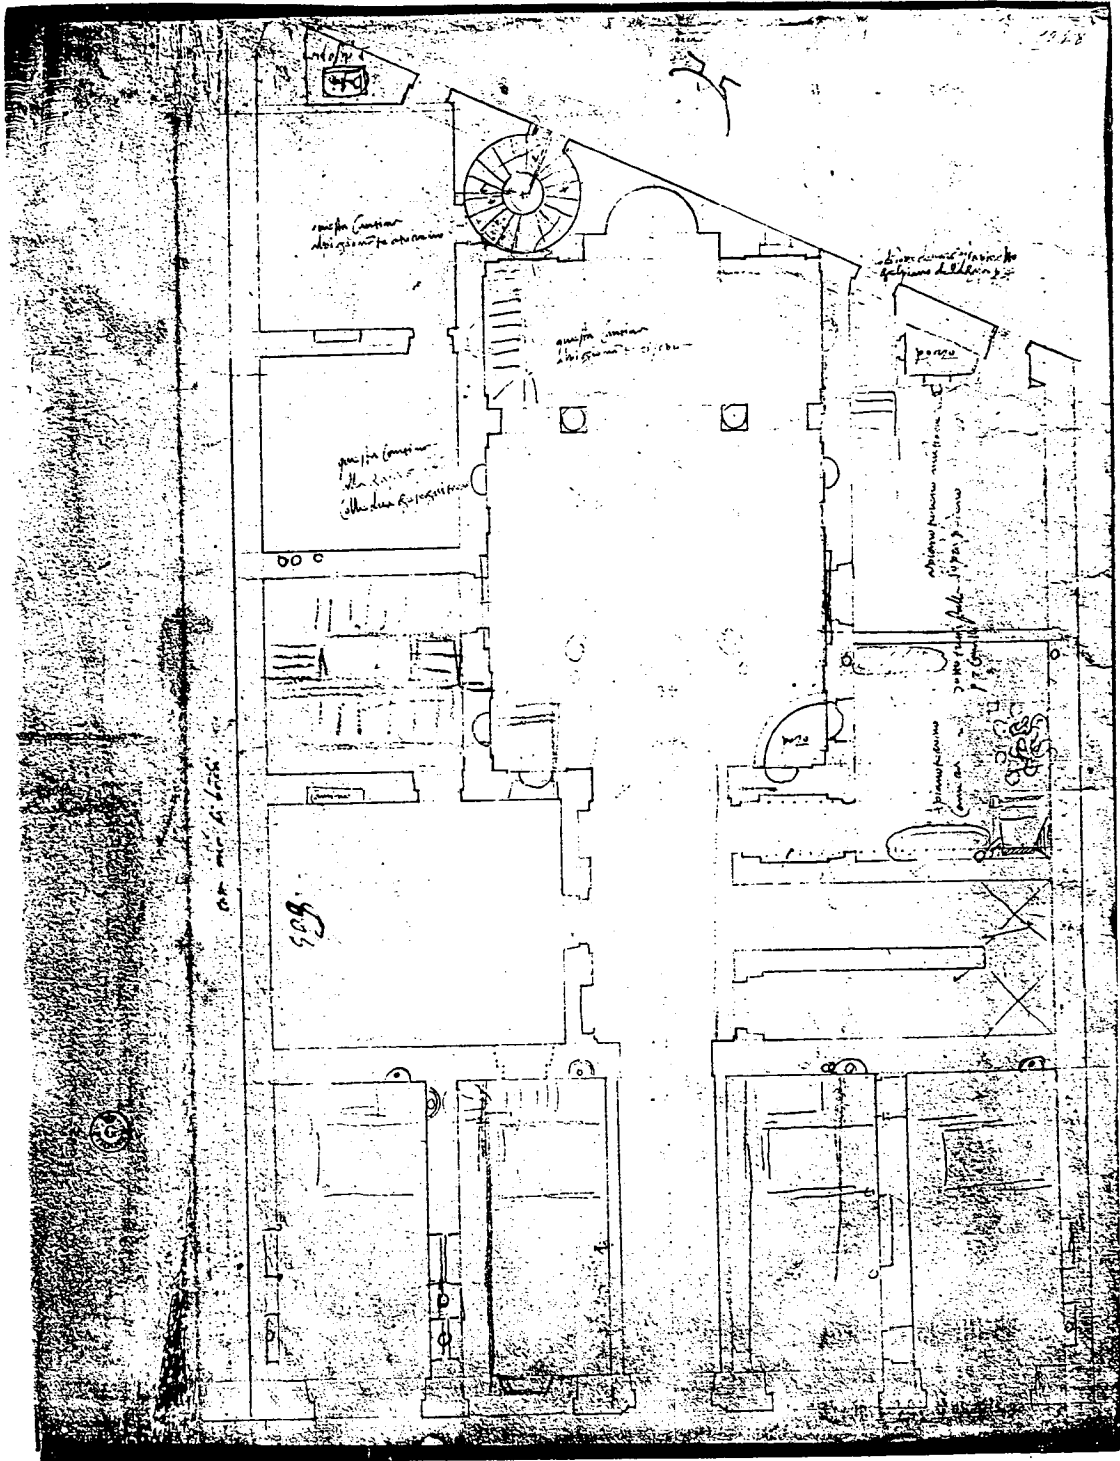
Antonio da Sangallo the Younger: plan for house on the via Giulia (Uffizi 1315 A)
